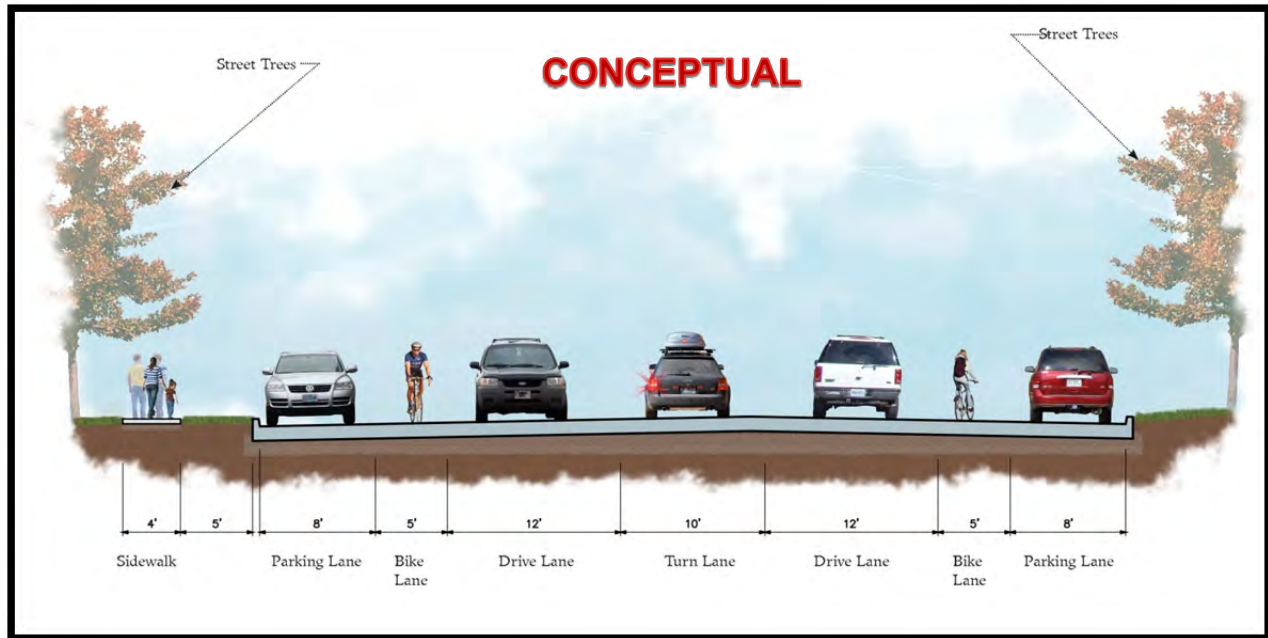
Shrewsbury Avenue – Potential Cross-Section
